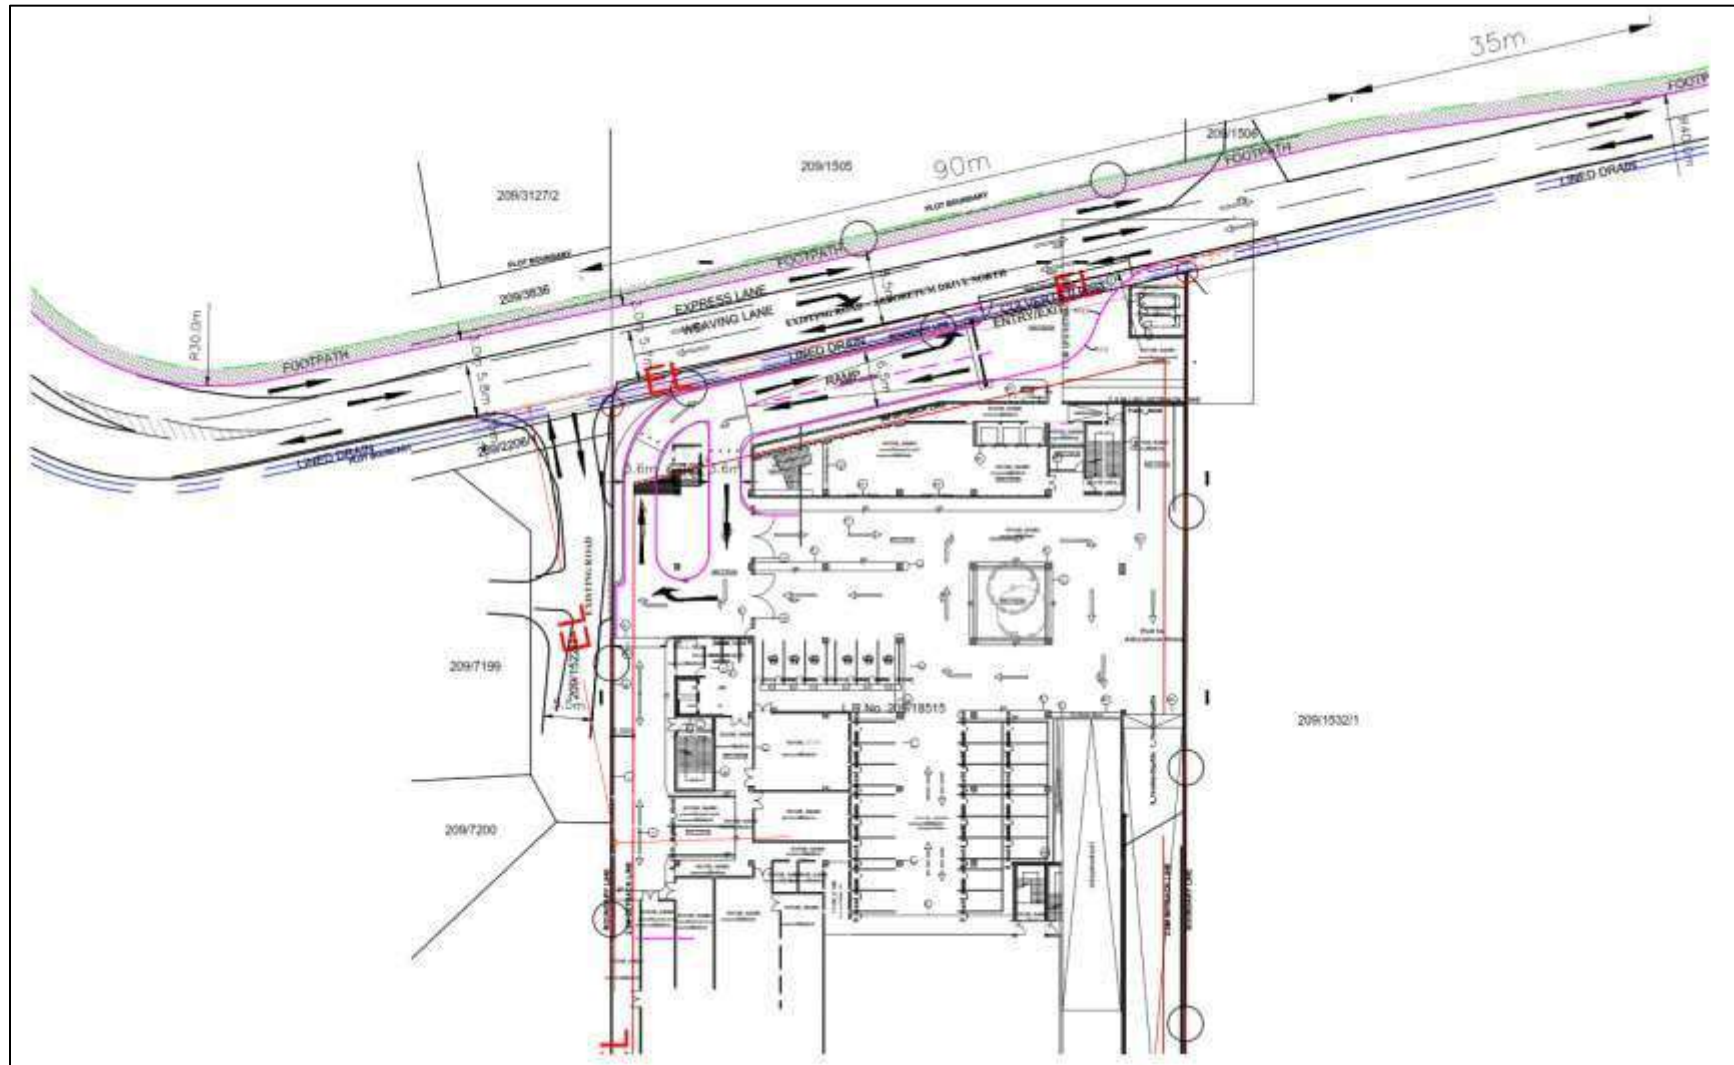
Proposed Access Design Layout Along Arboretum Drive 1 (North)
